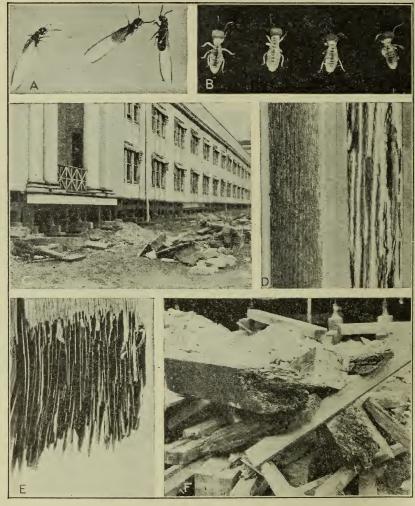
Termites may add greatly to the first cost of a building that has been improperly constructed. A, Winged adults of an eastern subterranean termite, Reticulitermes virginicus. B, Mature workers of the common eastern subterranean termite, Reticulitermes fluvipes. C, Temporary Government building in Washington, D. C., damaged from foundations to roof by subterranean termites. To prevent complete destruction of this building it was necessary to remove the untreated wooden foundation pillars and replace them with concrete pillars. D, Damage to oak flooring by Reticulitermes fluvipes. Note that the damage is not apparent on the upper surface (left). E, Pine barn sill cut into ribbons by a subterranean termite, Reticulitermes sp., at Mayfield, Kans. F. Closer view of the termite-damaged, untreated wooden pillars of the Government building shown in C
